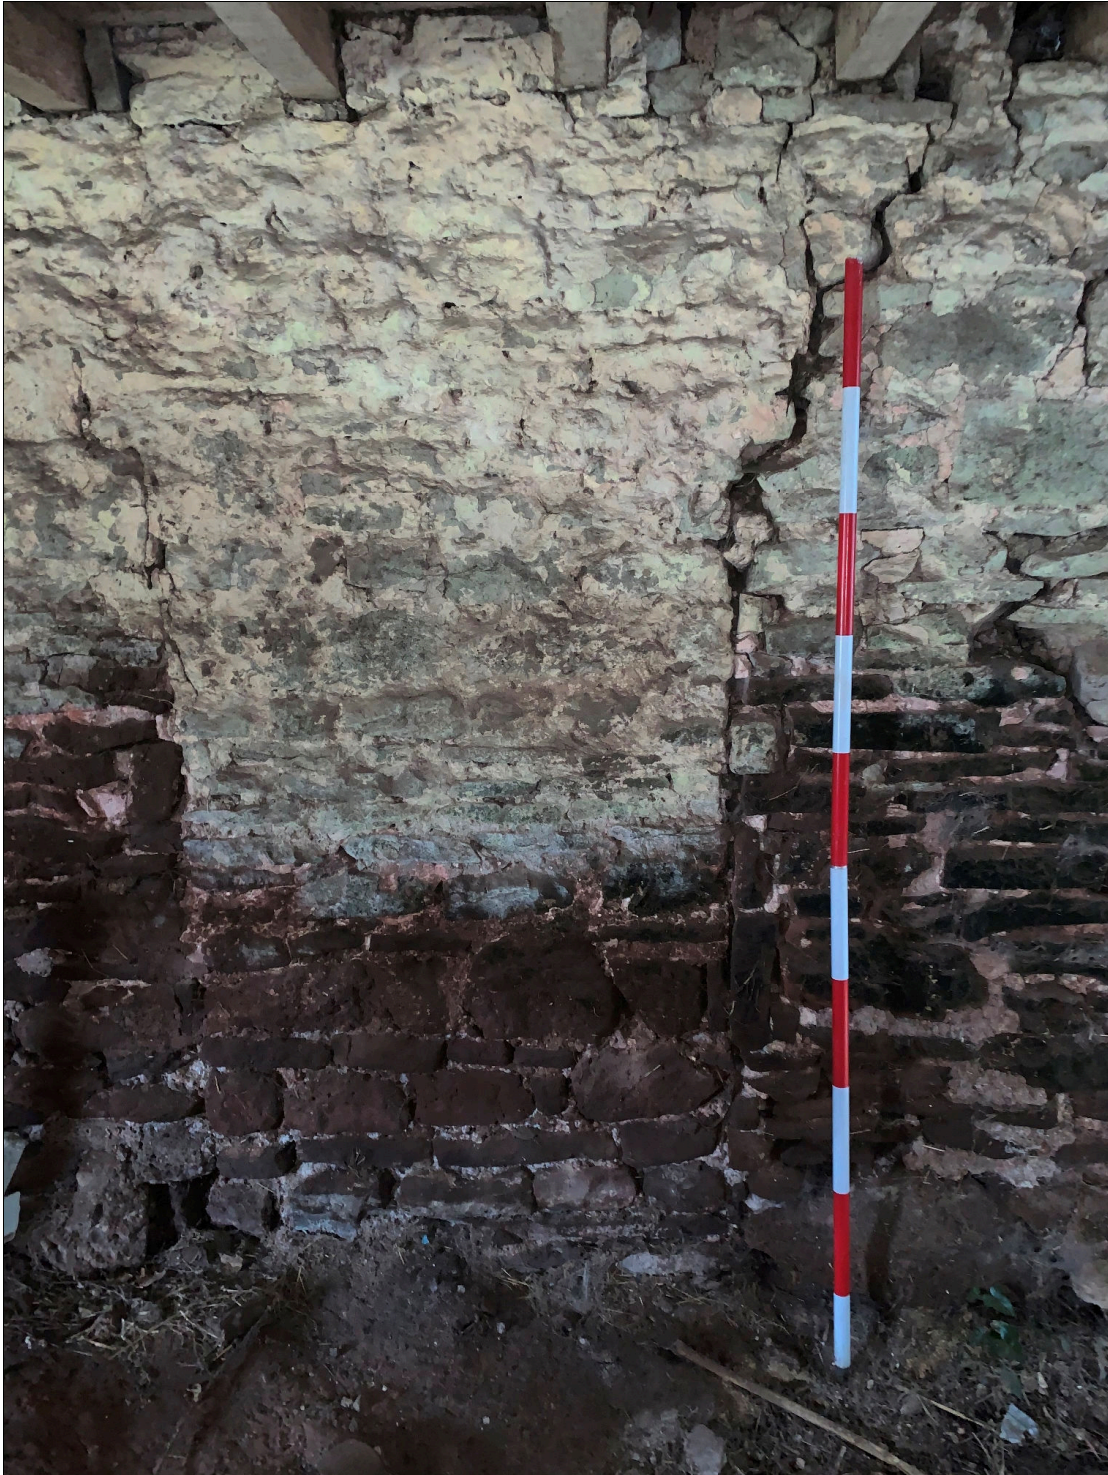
LLN2020_0074 - A view of the blocked up doorway through the southern wall of the cow house. Looking south.
